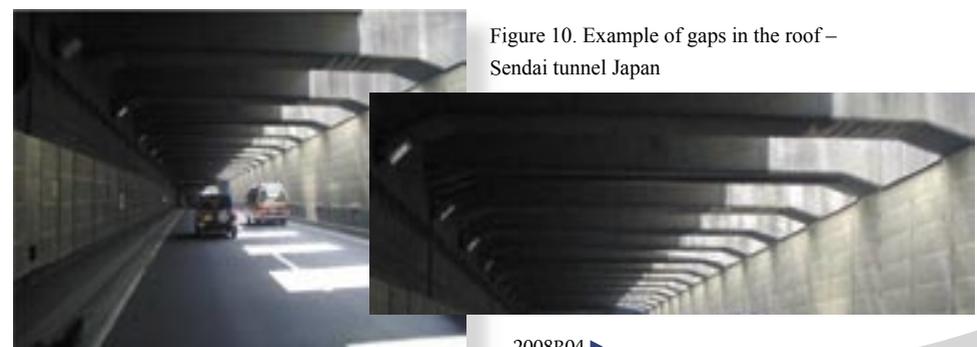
Example of gaps in the roof – Sendai tunnel Japan
